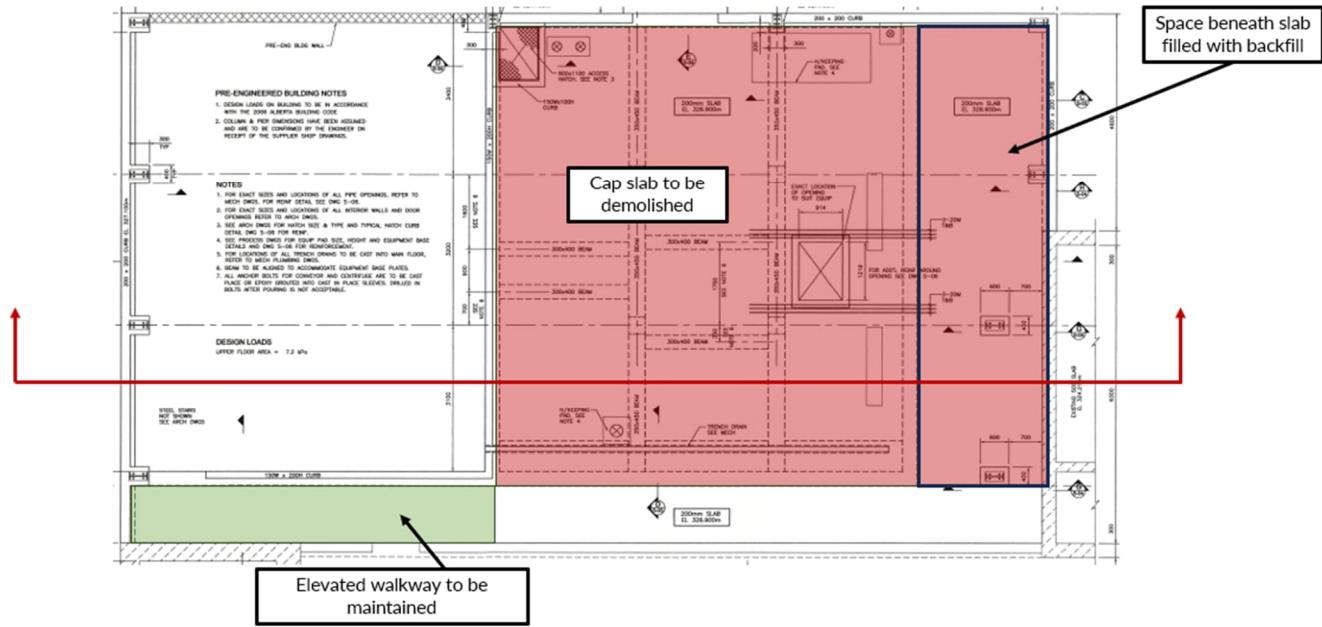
Section through Dewatering Building – Demolition and New Floor Assembly Mark-ups
